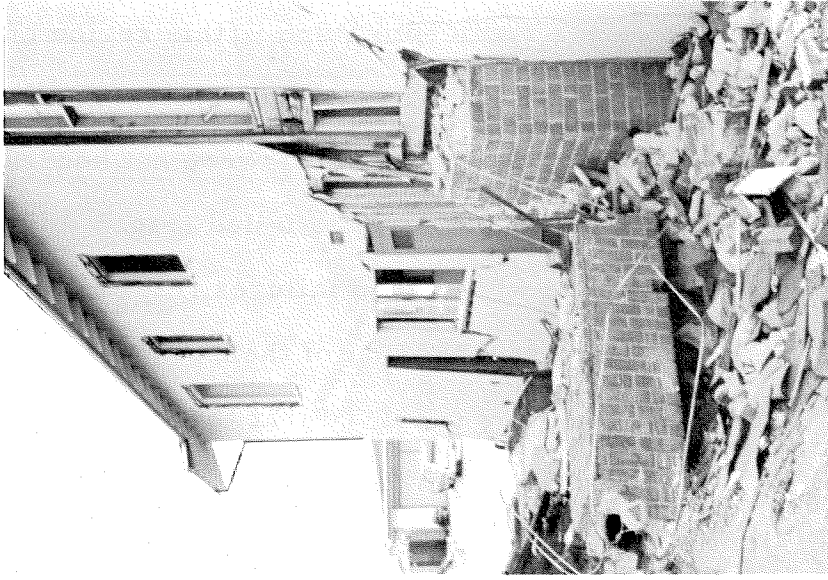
188 Typical chimney with four half inch vertical reinforcing bars, structurally independent of the adjacent house, Aldergrove Street.
